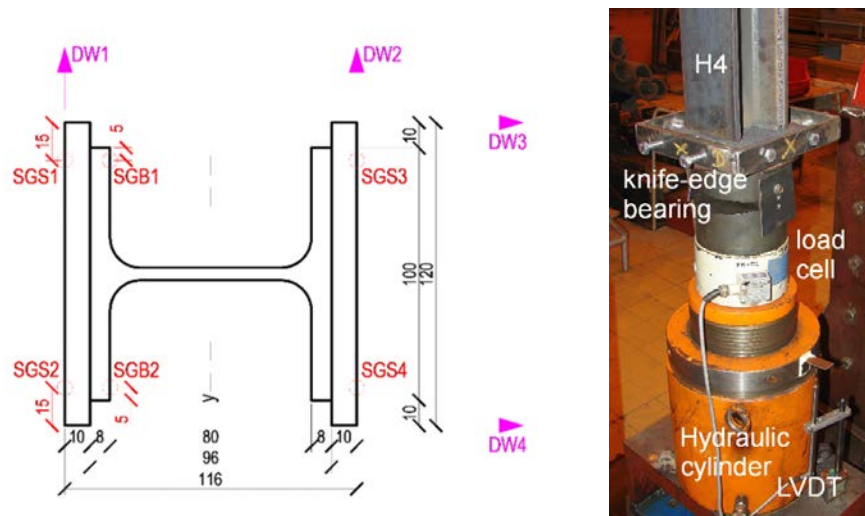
(left) Column cross-section dimensions, (right) strain gauges (SGS, SGB) and draw wire sensors (DW) positions; specimen H4 in test set-up.
